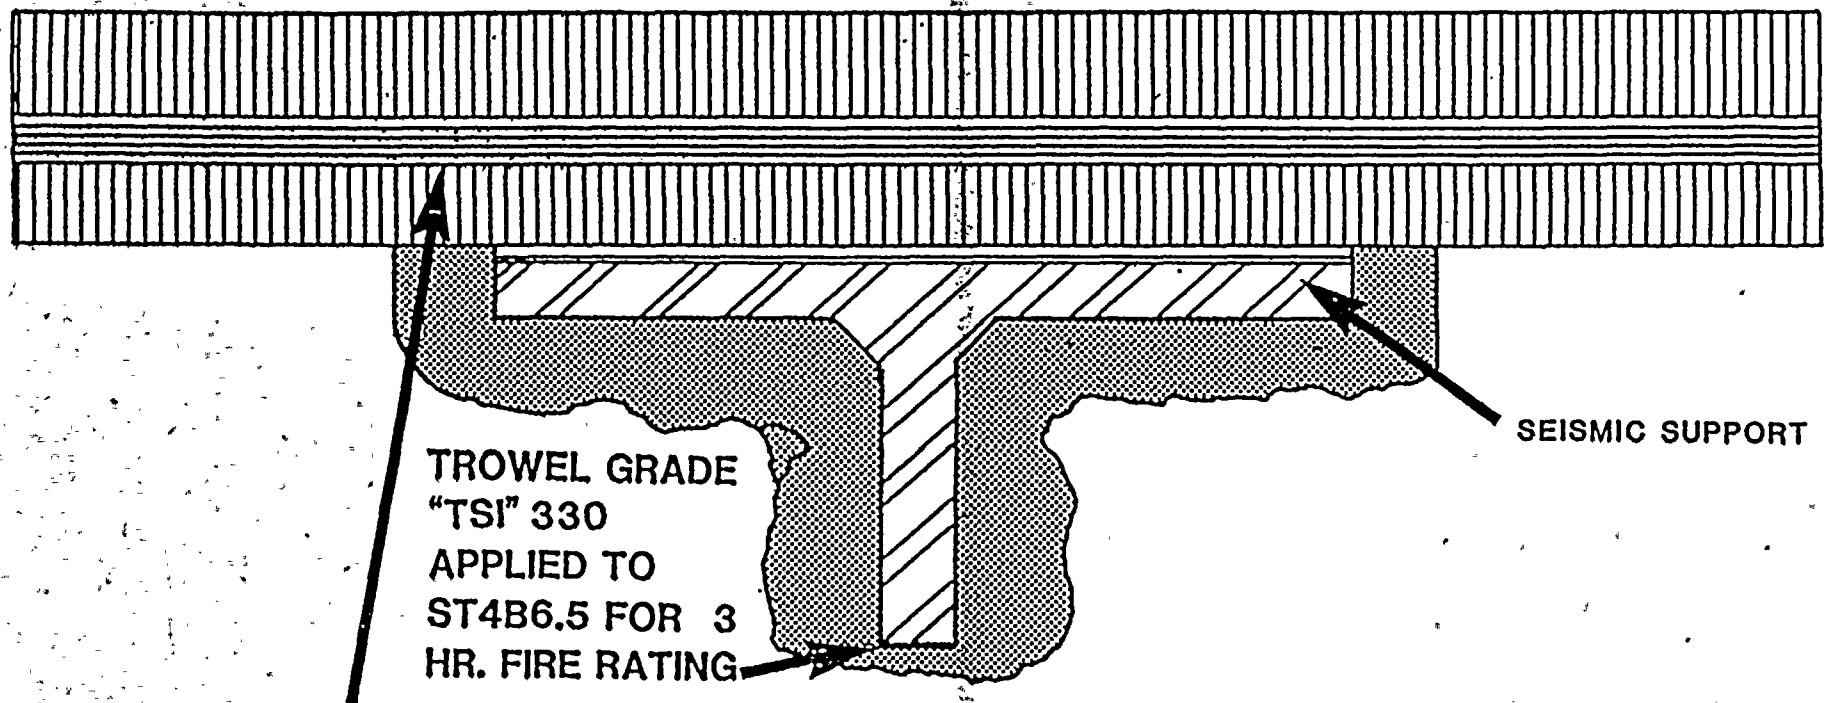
ELEVATION OF CCW PUMP FIRE BARRIER
